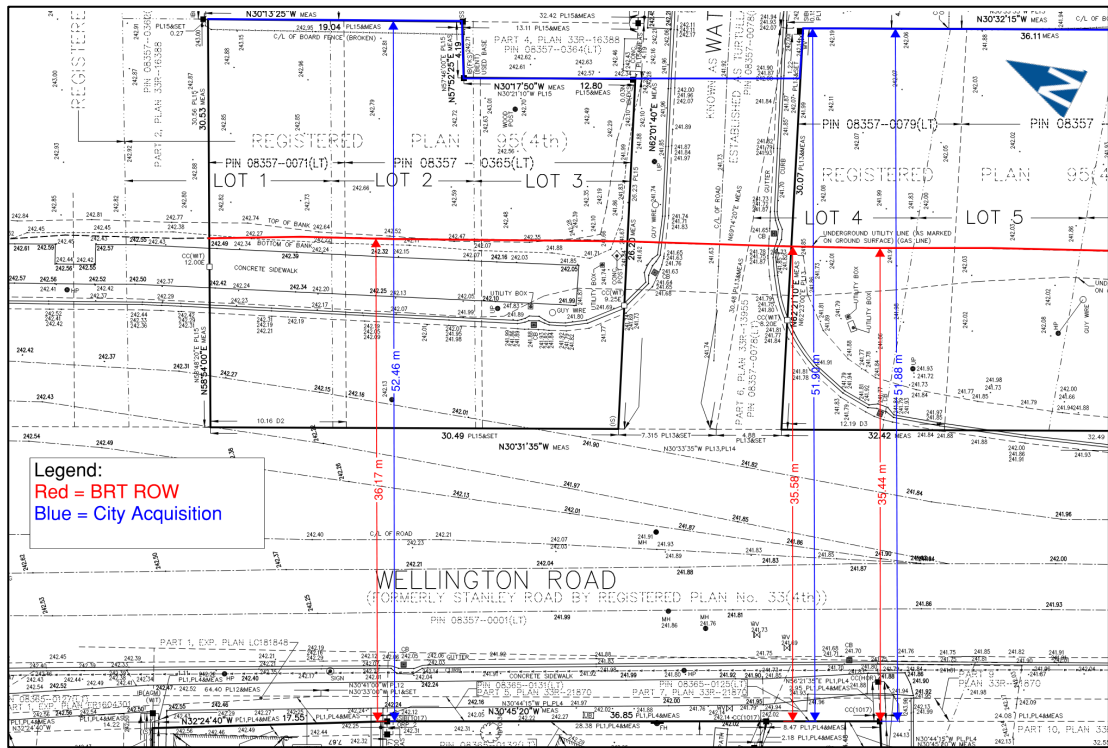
Secured ROW Width for the Wellington Gateway Project
